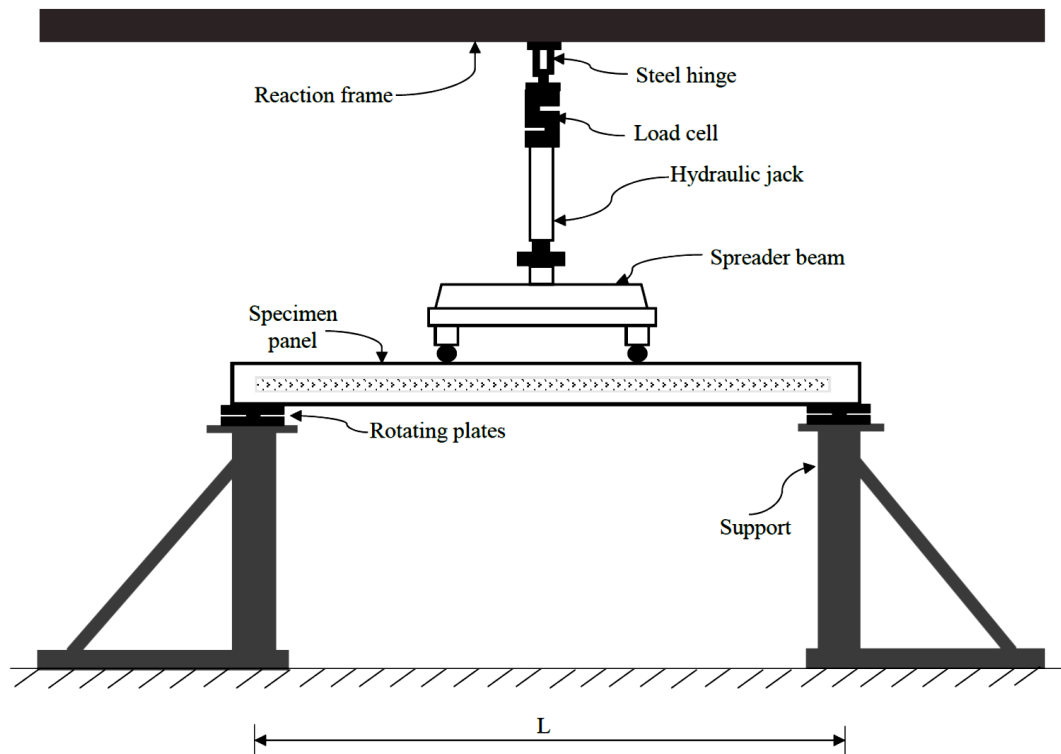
Test setup: Arrangement of four-point bending for all specimen
